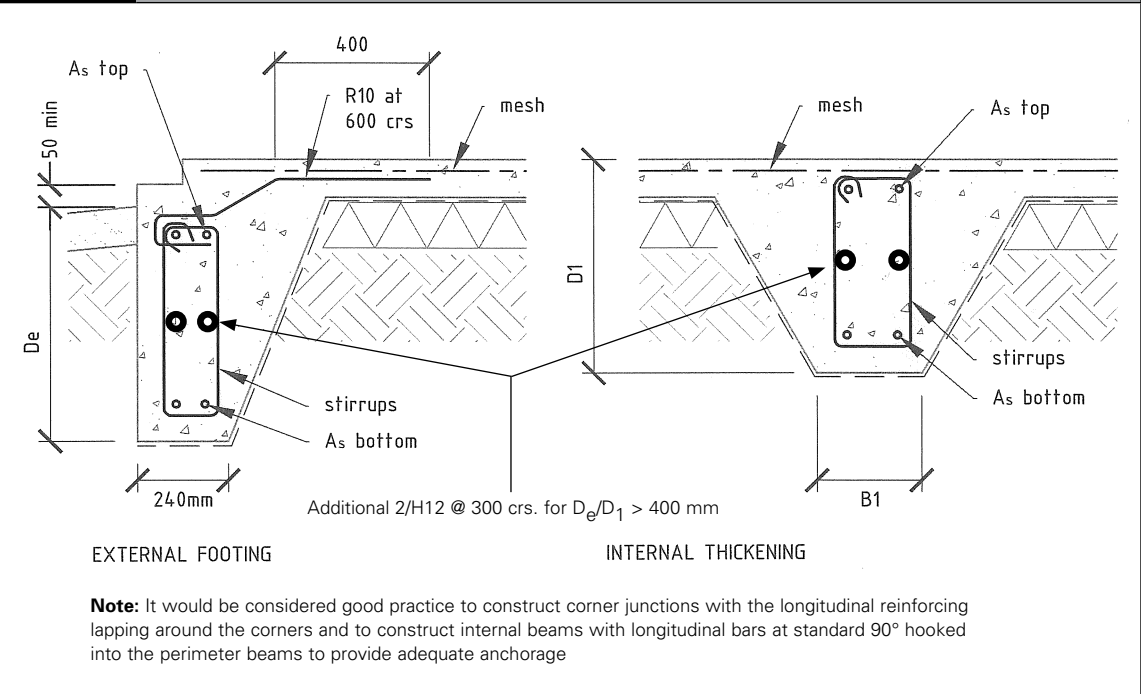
Reinforced concrete foundations in expansive soils for medium wall and heavy wall claddings
